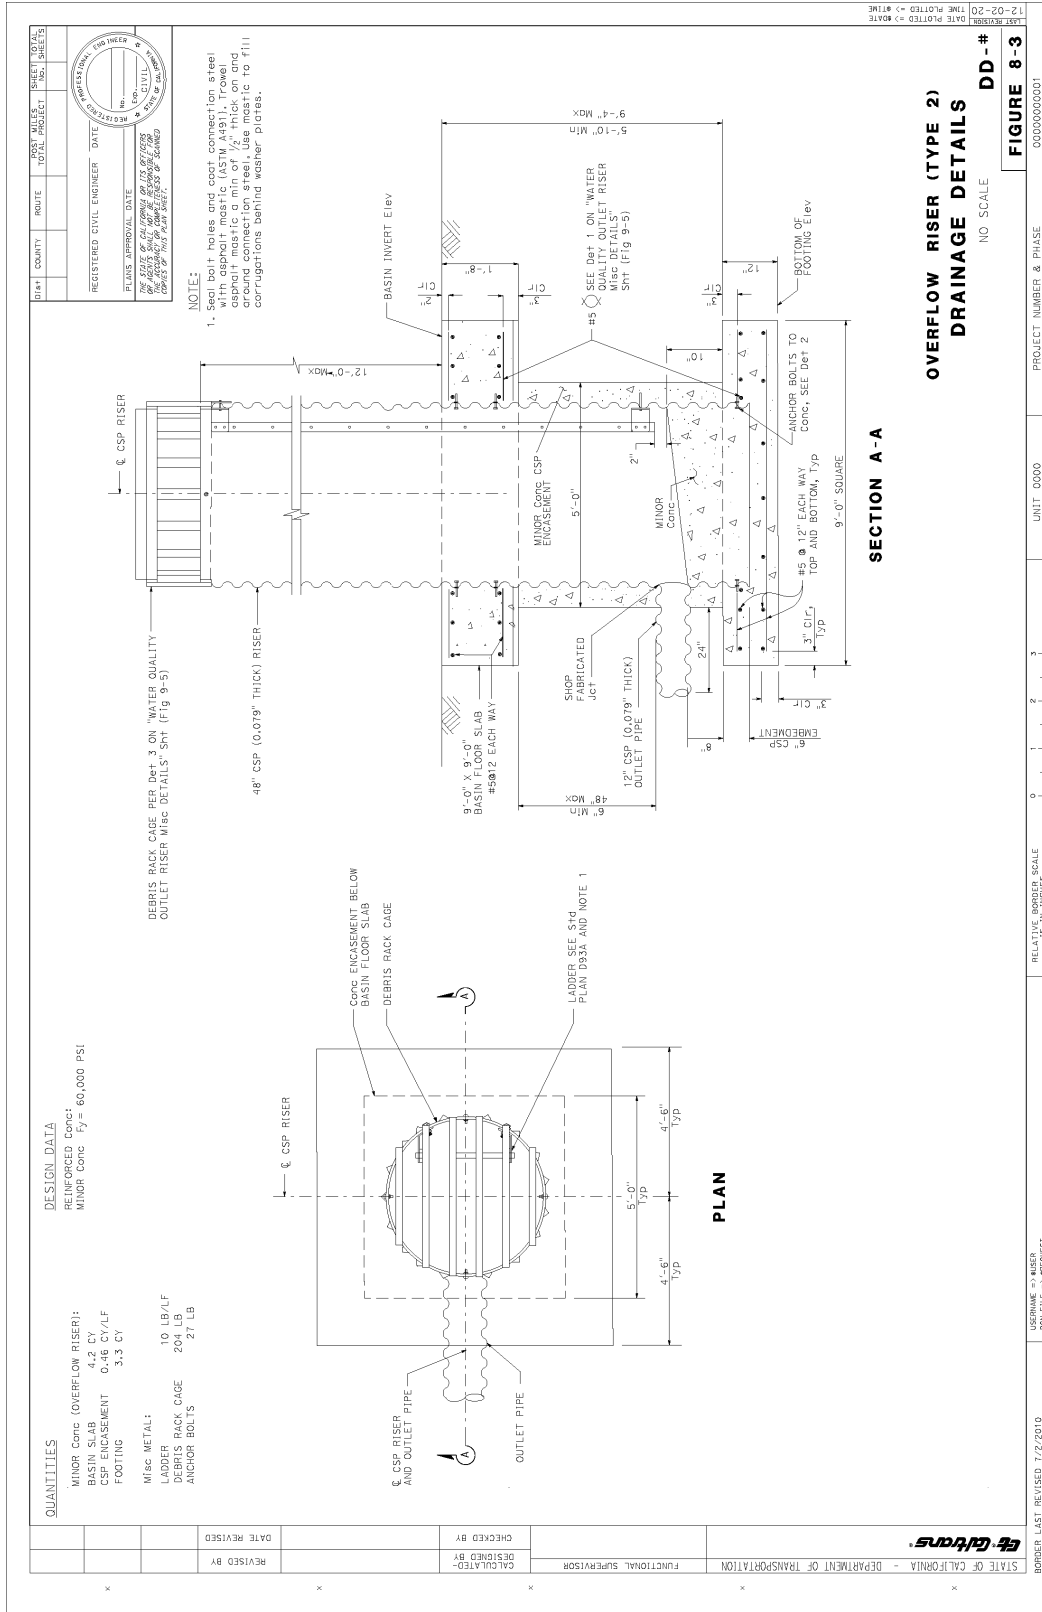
Overflow Riser (Type 2), Drainage Details
